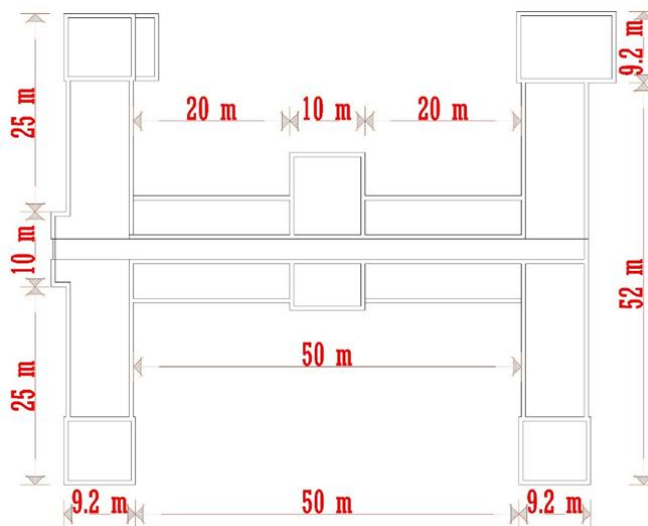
Plan view of the El Feth High School. Source: Design office Bouras
